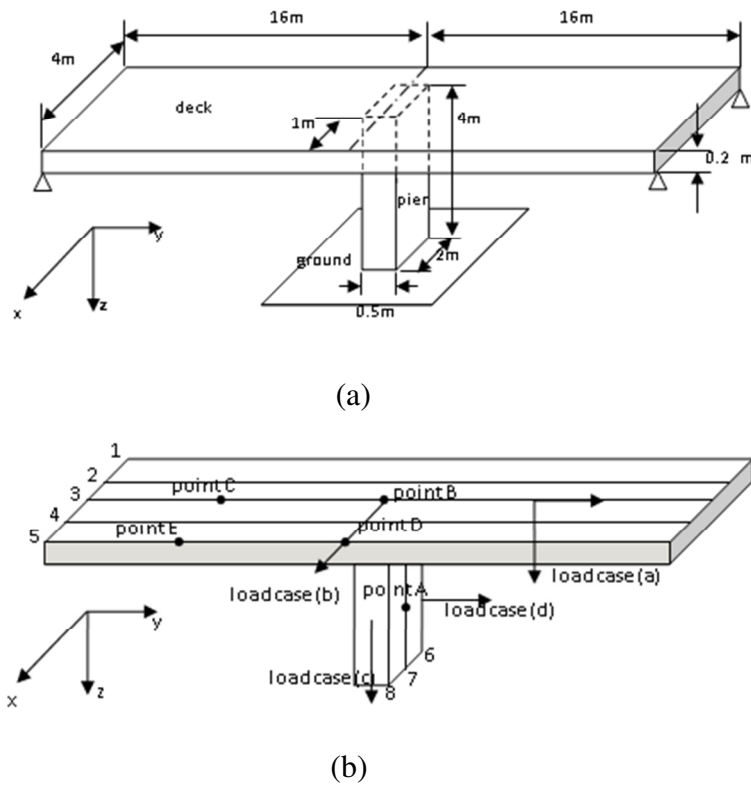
An FRP slab girder bridge (a) geometry; (b) IFSM model and forces
